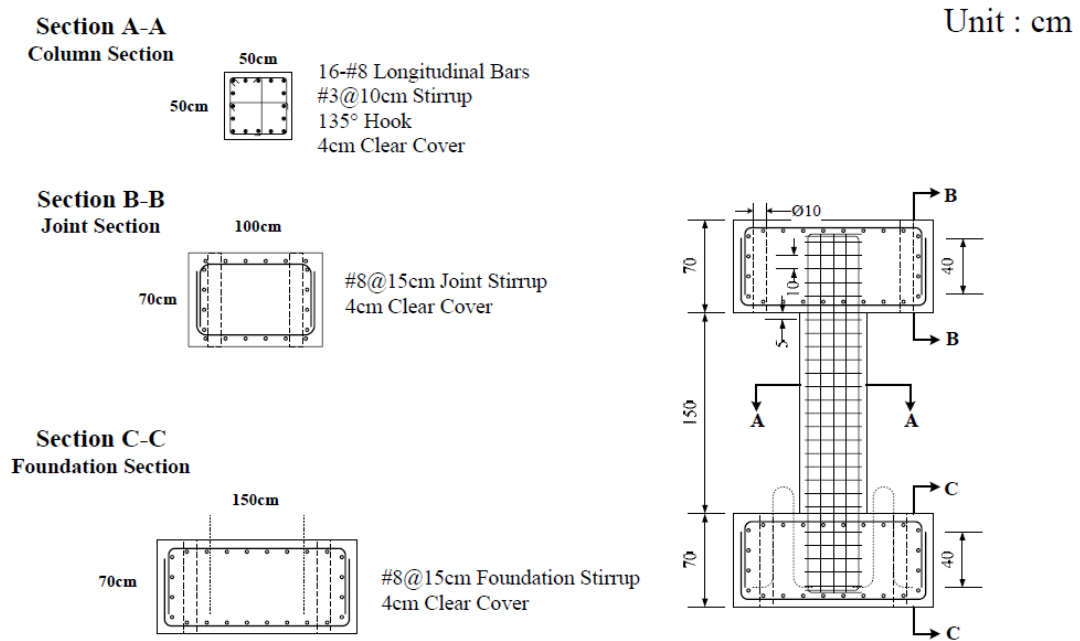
Cyclic loading test 3DL specimen design layout (Weng 2007)
